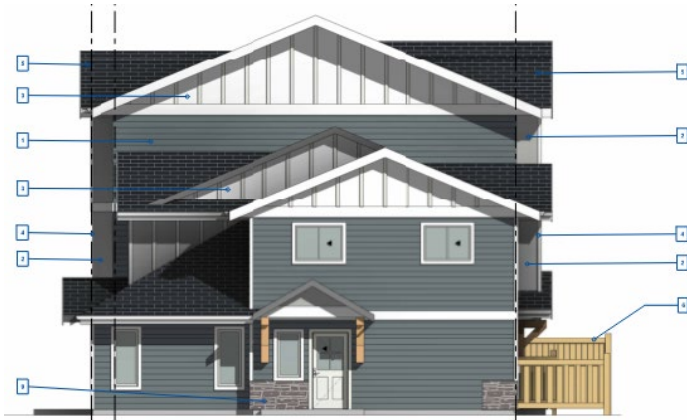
Building with a two-storey unit, Aspen Road frontage elevation
